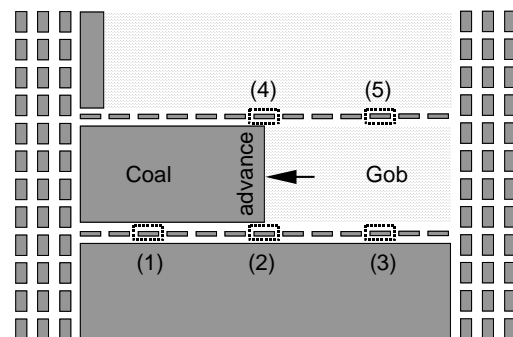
Simplified plan view of a two-entry longwall mine layout showing pillar loading stages.
